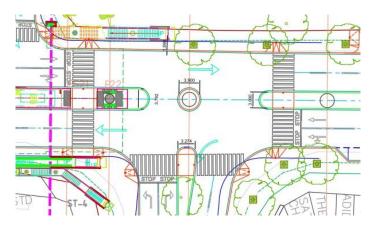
Intersection of J.P. Road and Balasaheb Sawant Road
